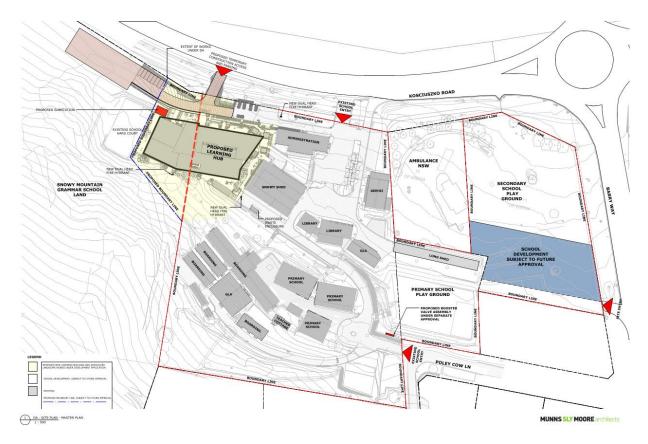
Overall site plan with the existing school and proposed learning hum in yellow
